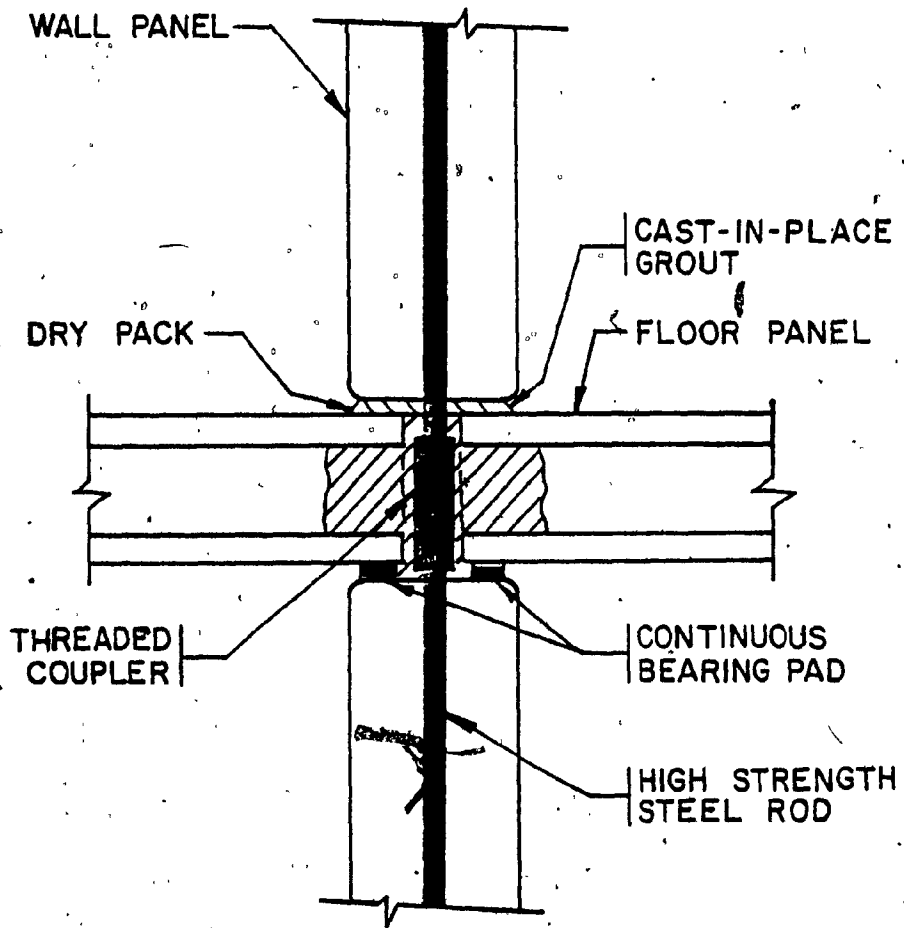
VERTICAL TIE ARRANGEMENT, (REF. 2)
